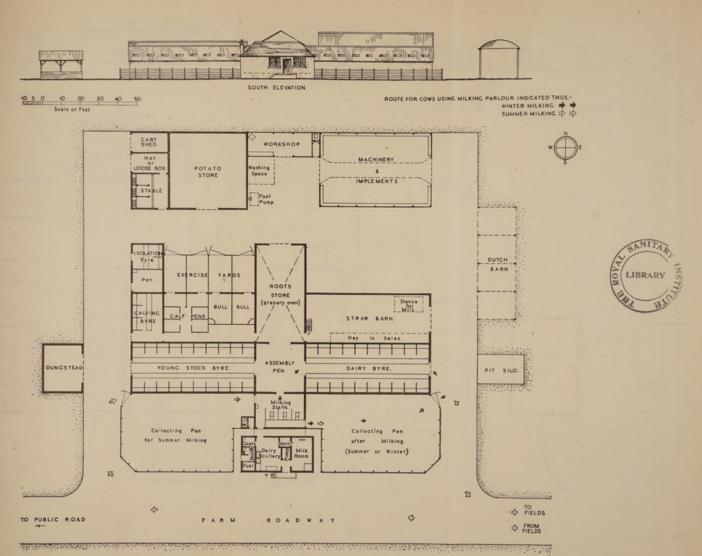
Plan D. Steading for Mixed Arable and Dairy Farm (Byre System) for 200 to 250 Acres (See paragraph 54)
